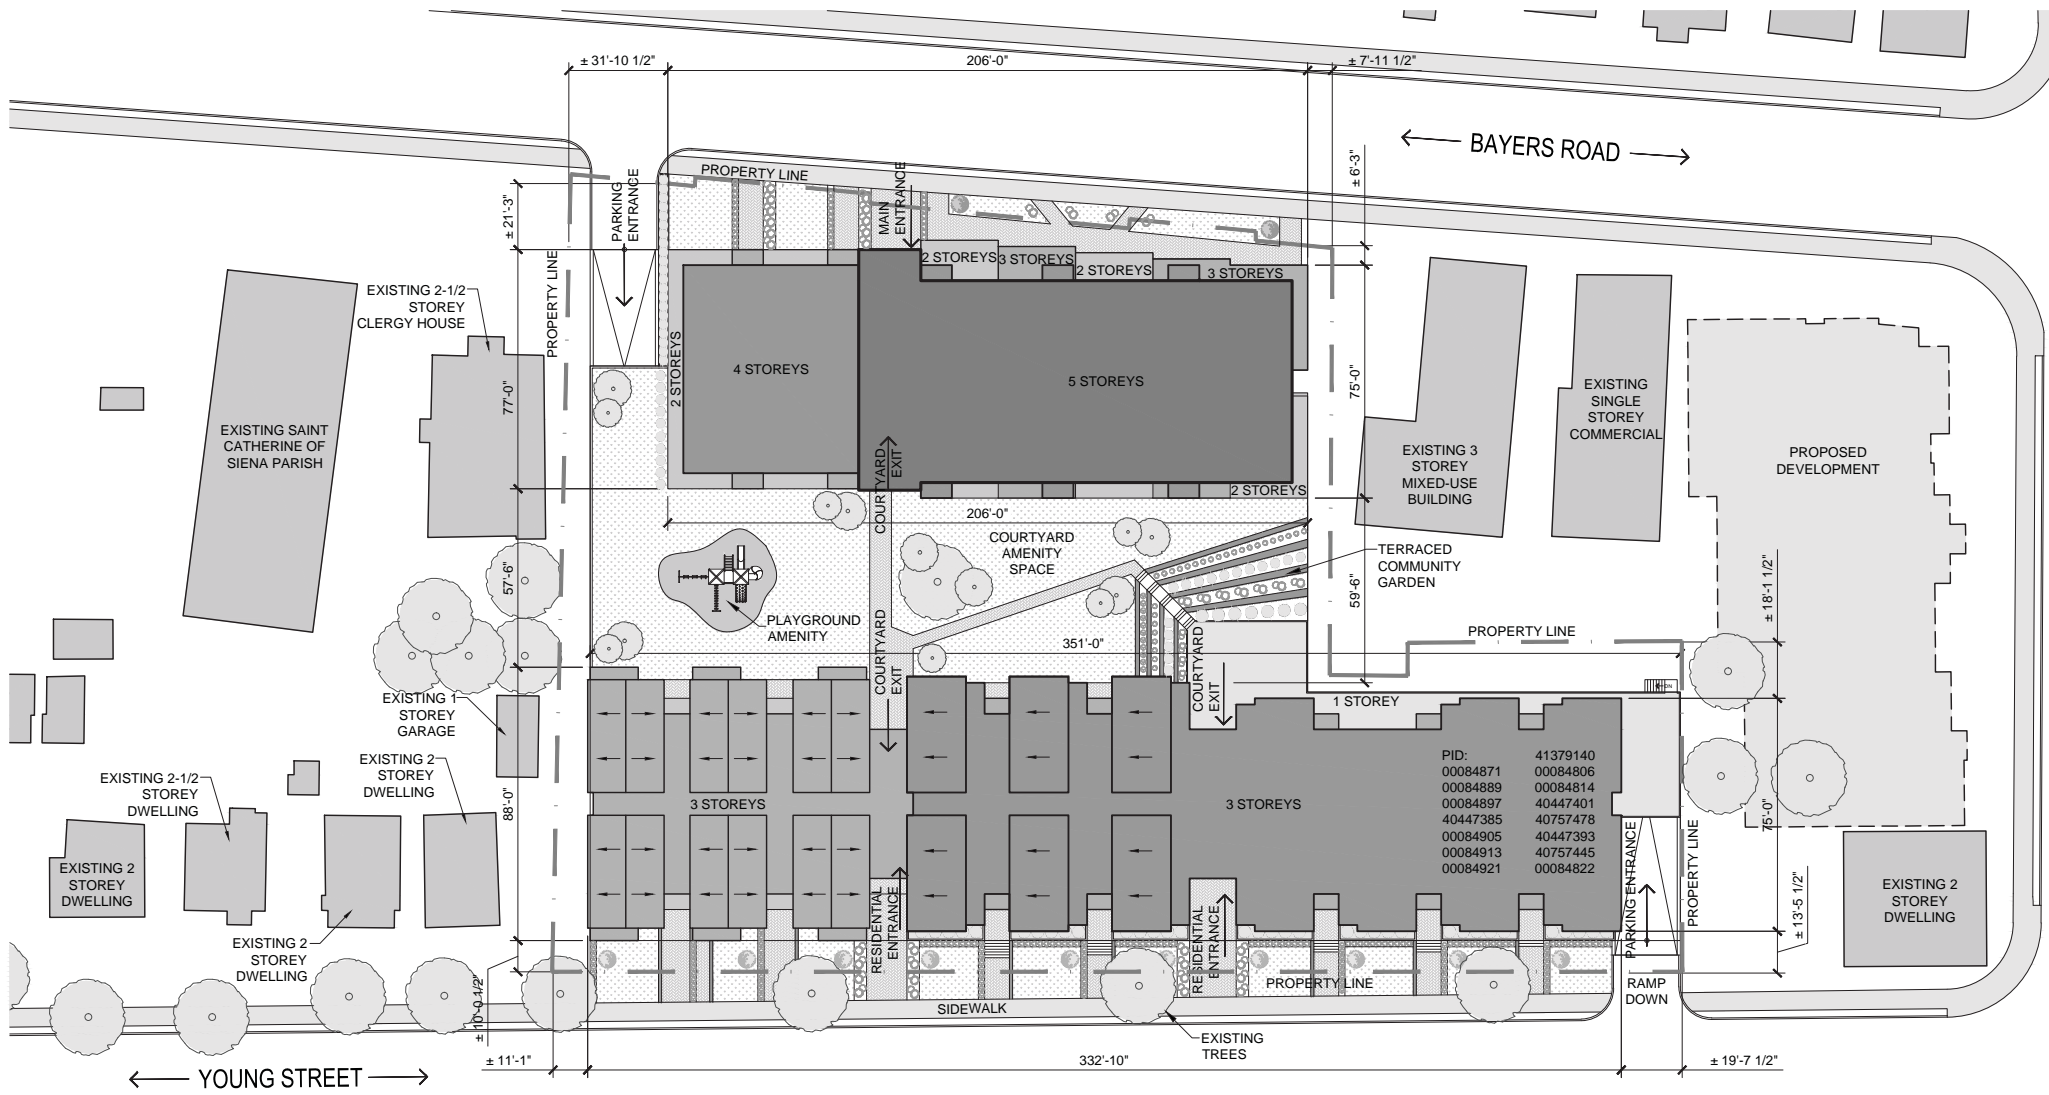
Proposed development site on Bayers Road and Young Street between Oxford Street and Connolly Street.
